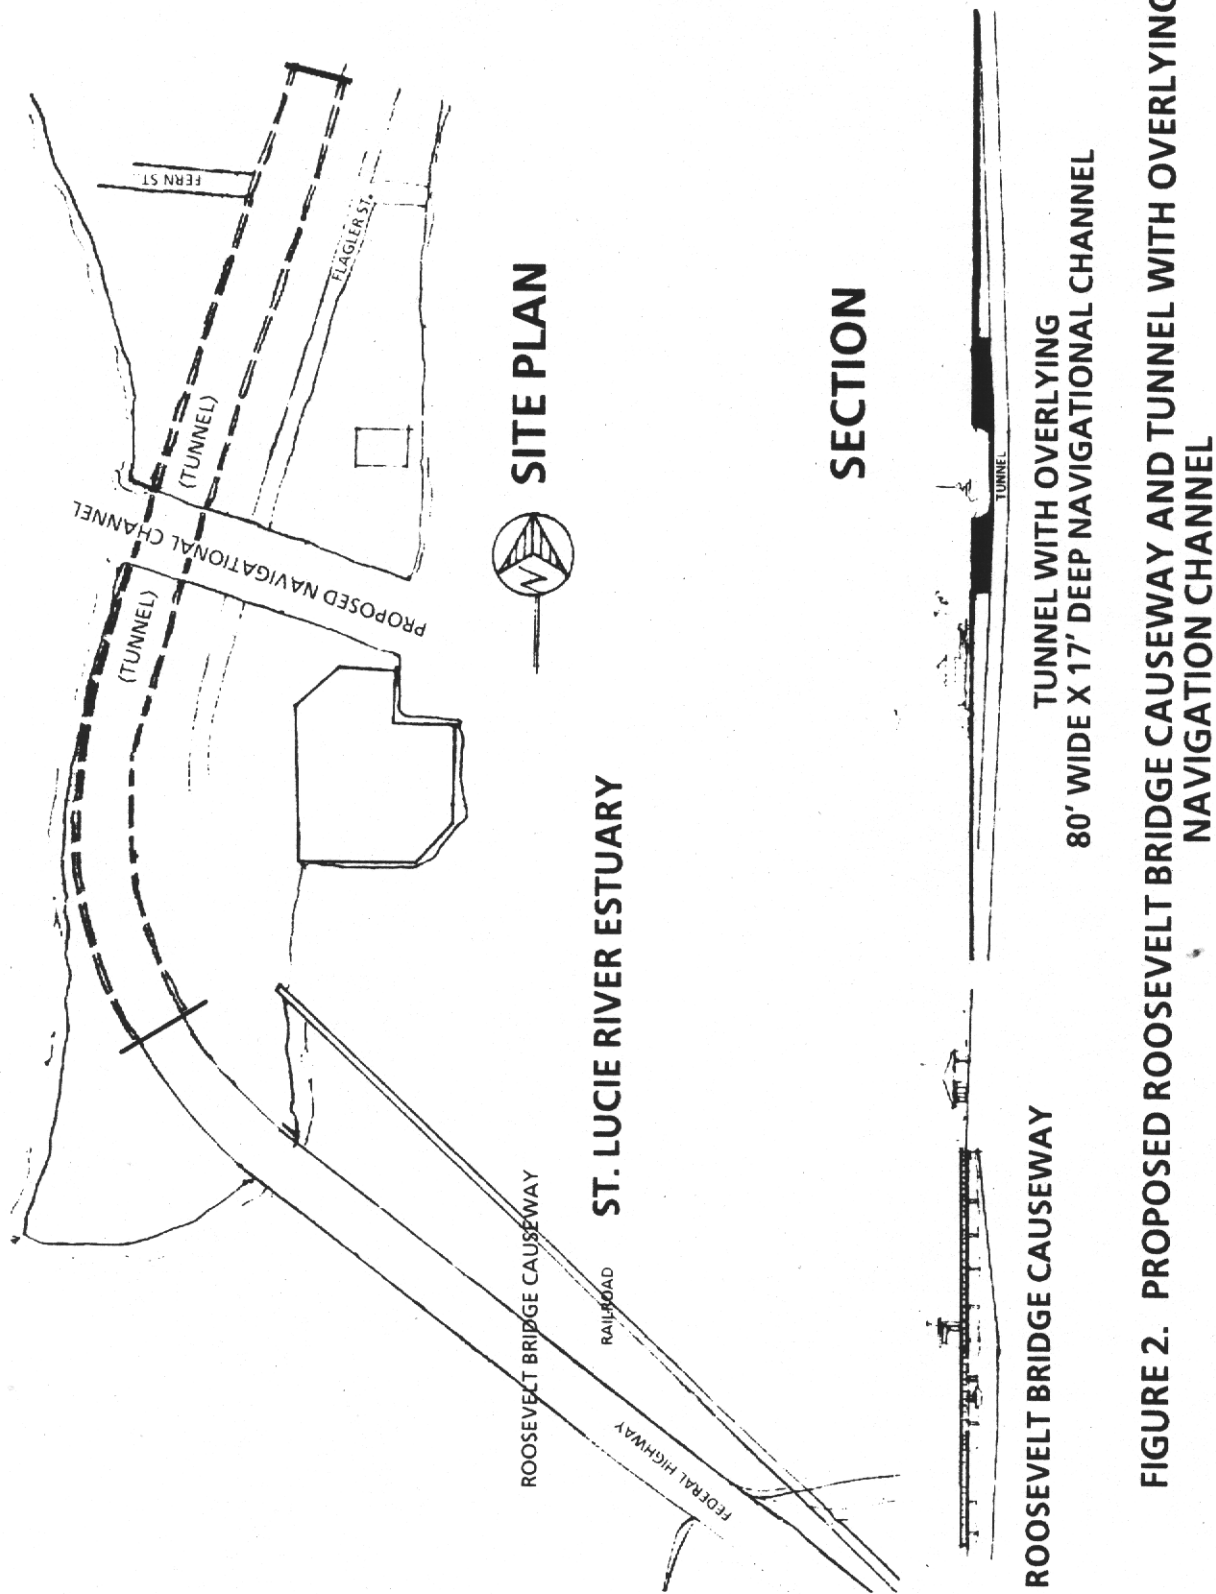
PROPOSED ROOSEVELT BRIDGE CAUSEWAY AND TUNNEL WITH OVERLYING NAVIGATION CHANNEL
